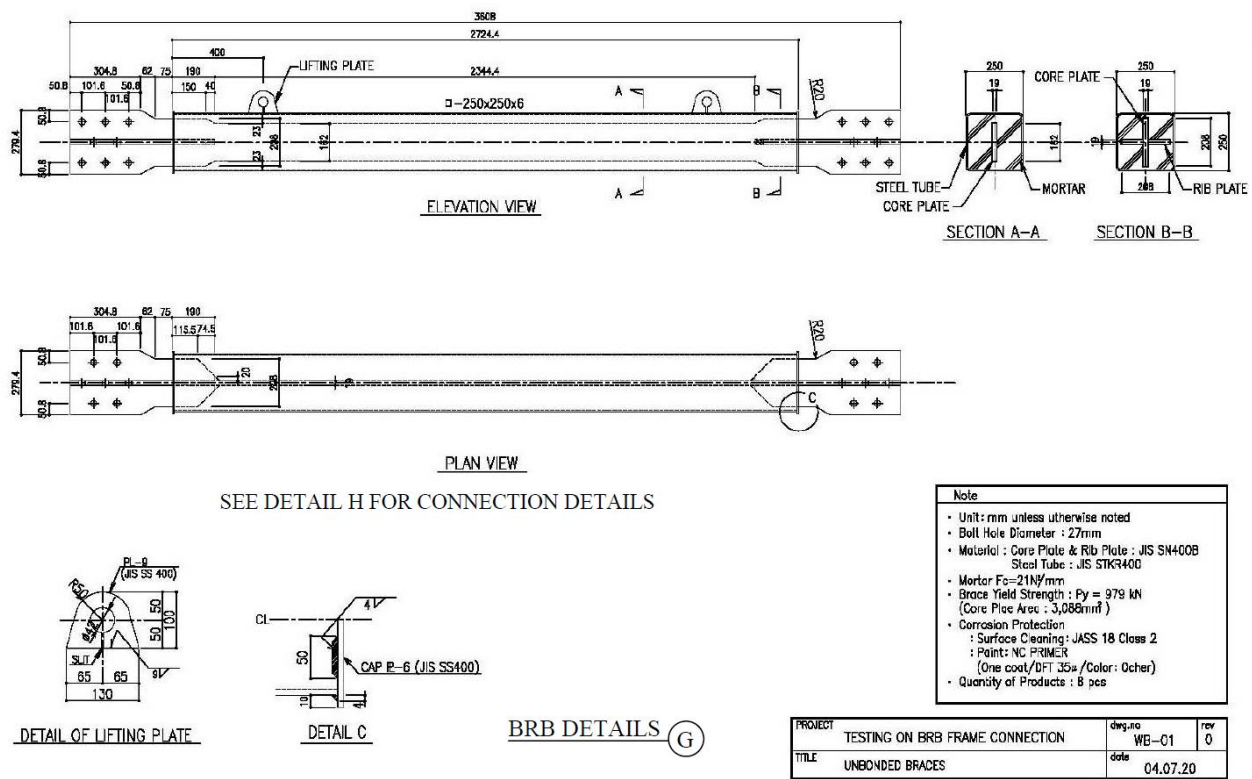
BRB Detail (Courtesy Nippon Steel)
